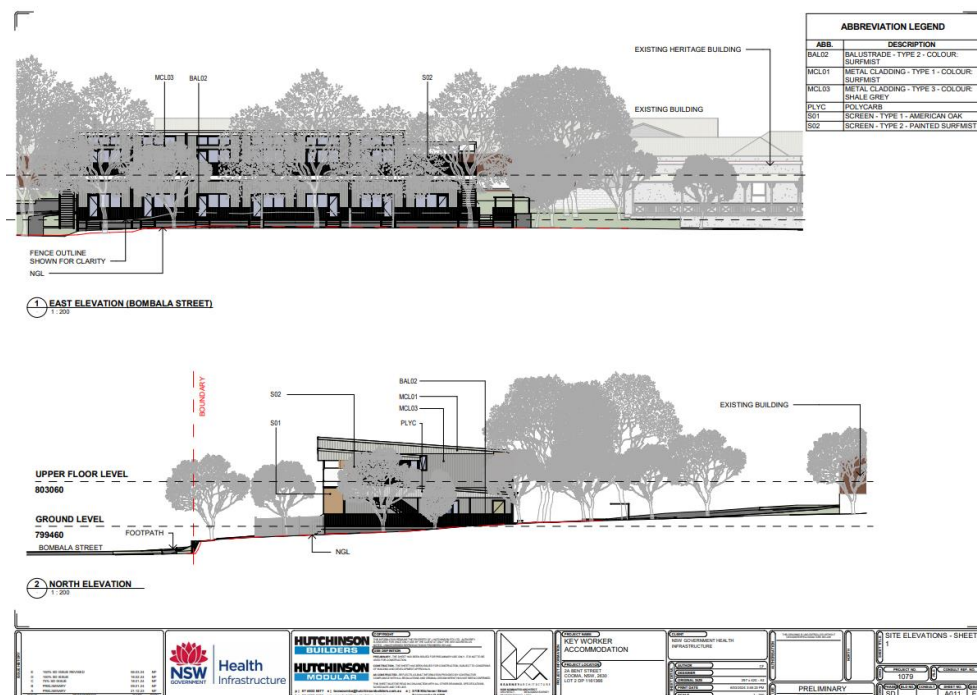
Site Elevations – Sheet 1 (Source: Kearney Architecture)
